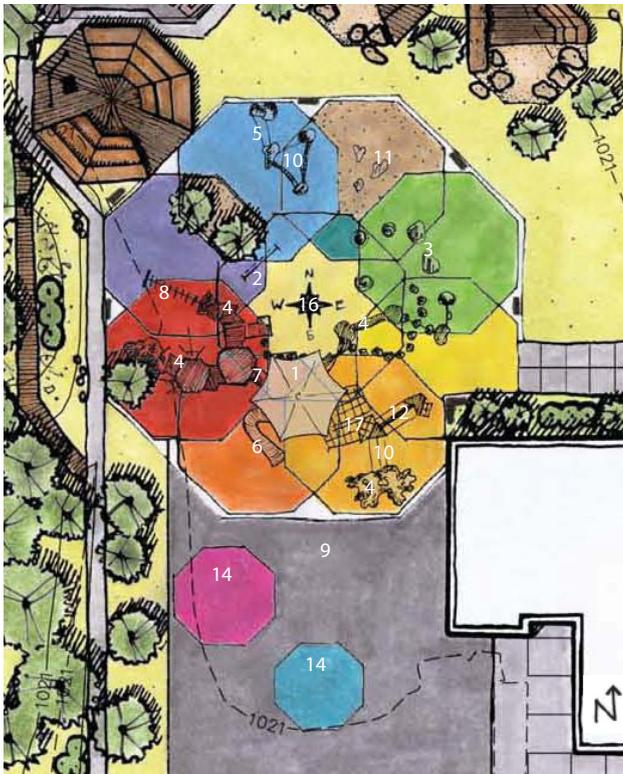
Enlarged Plan of West Playground. Not to Scale. Plan by Author
